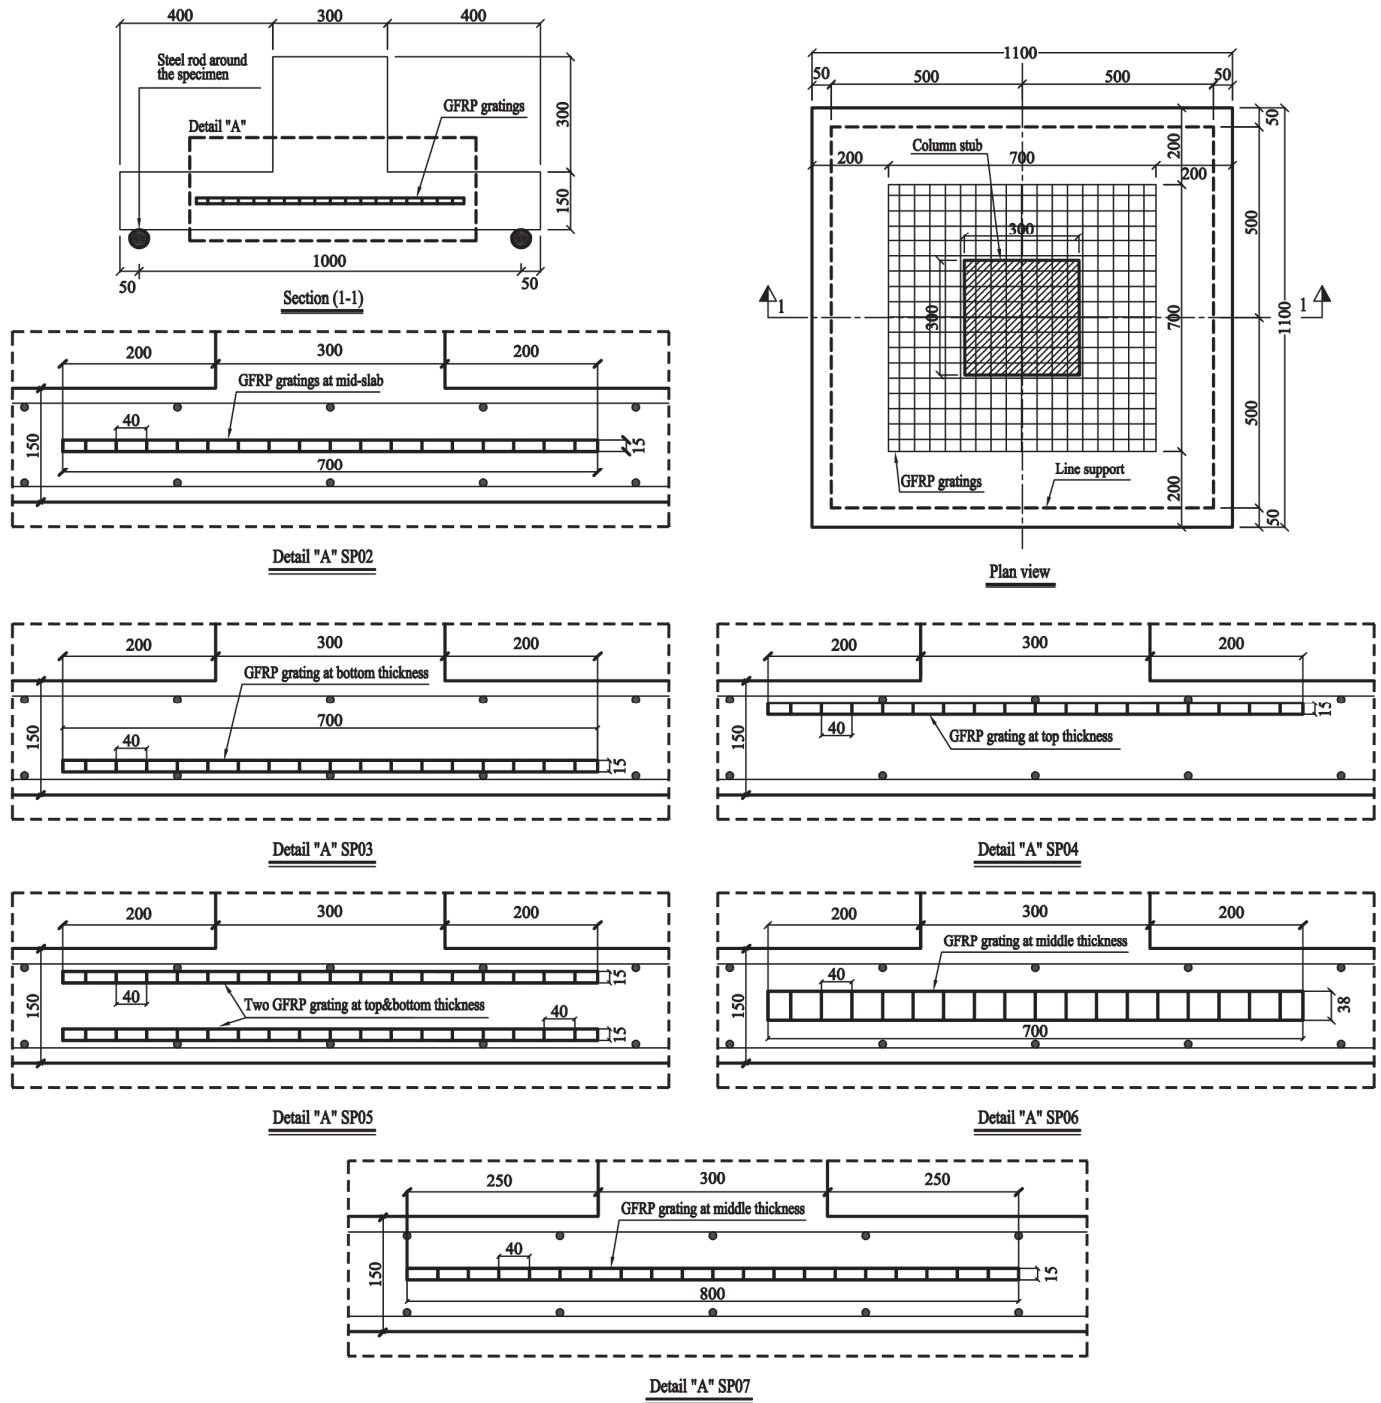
Typical concrete dimensions for the tested specimens (all dimensions are in mm).
